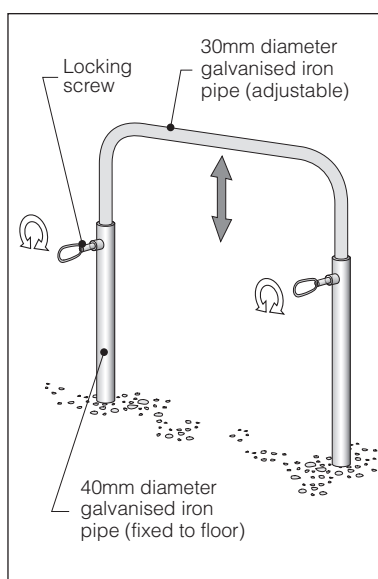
Adjustable handrail mechanism. Metal pegs or nails inserted into holes at different heights would be more robust
